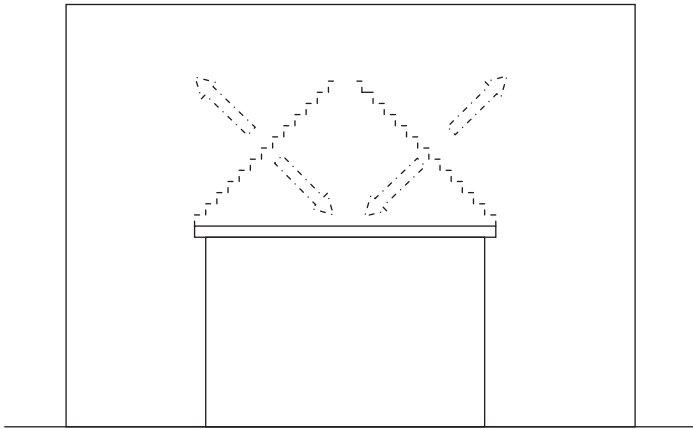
Imaginary arrows of tension intersecting on a supporting beam.
